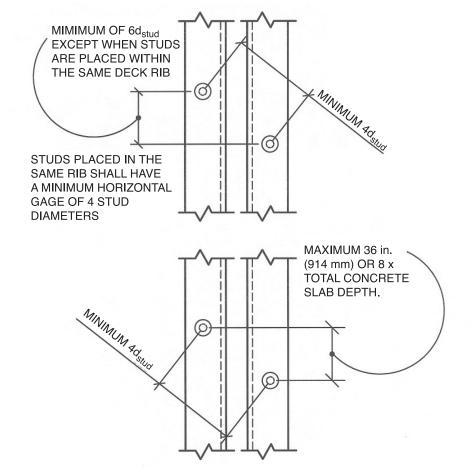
MINIMUM AND MAXIMUM LONGITUDINAL SHEAR STUD SPACING
